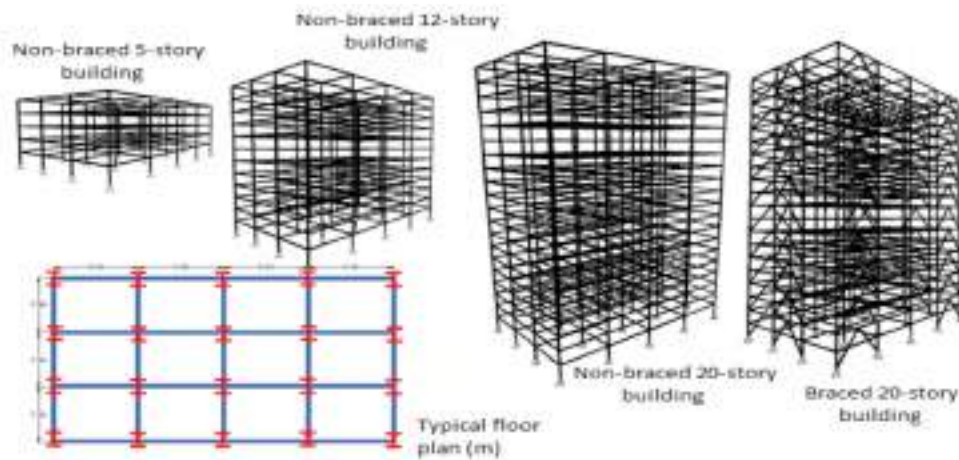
Structural diagrams and typical floor plan of the structures under study (adapted from García, 1996)
